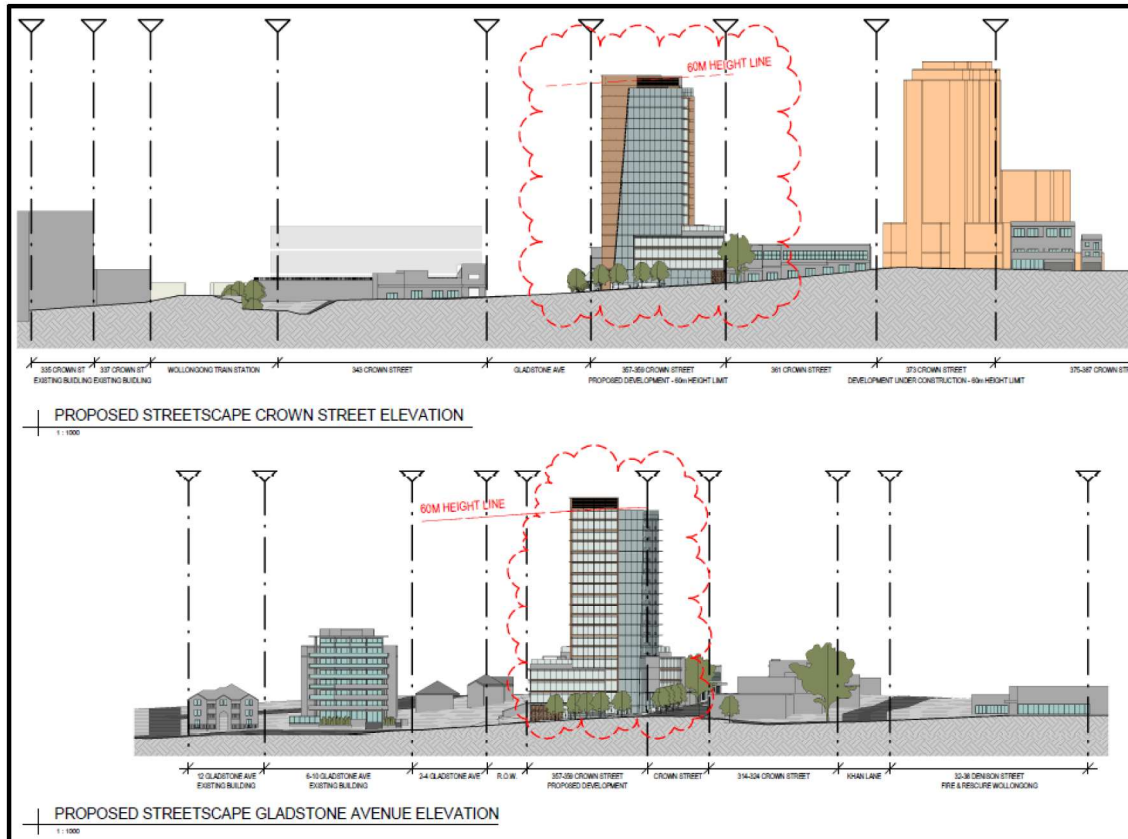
Proposed Streetscape Elevation (Proposed) (*Source: DWA)
